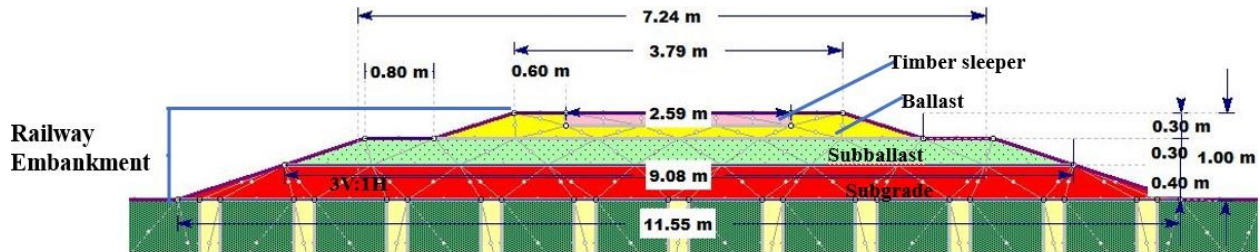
Cross-section of the railway embankment component with dimensions (for 3H:1V slope ratio).
